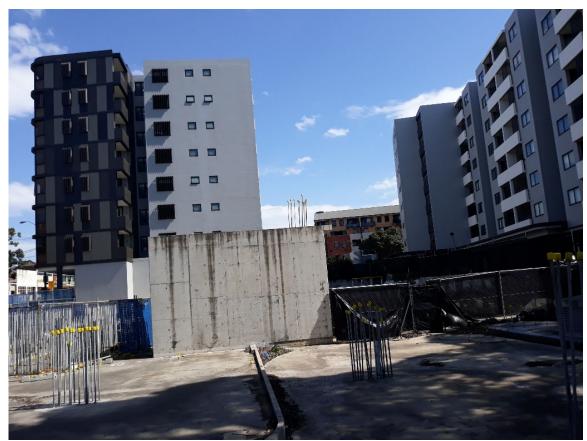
Subject site of the proposed Building C as viewed from Ismay Reserve to the east.
